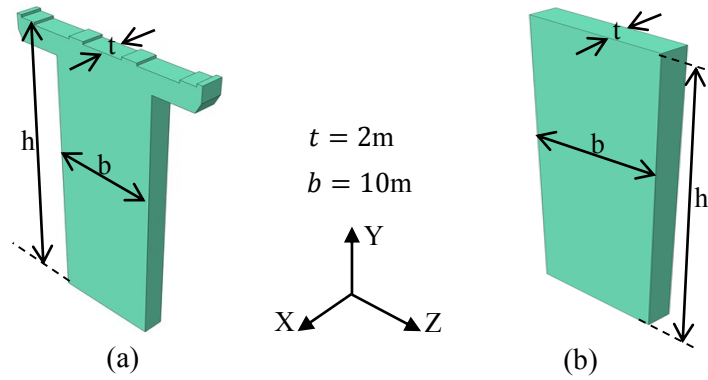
Pier structure: (a) actual geometry; and (b) approximate geometry for beam model of multi-span bridge models.
